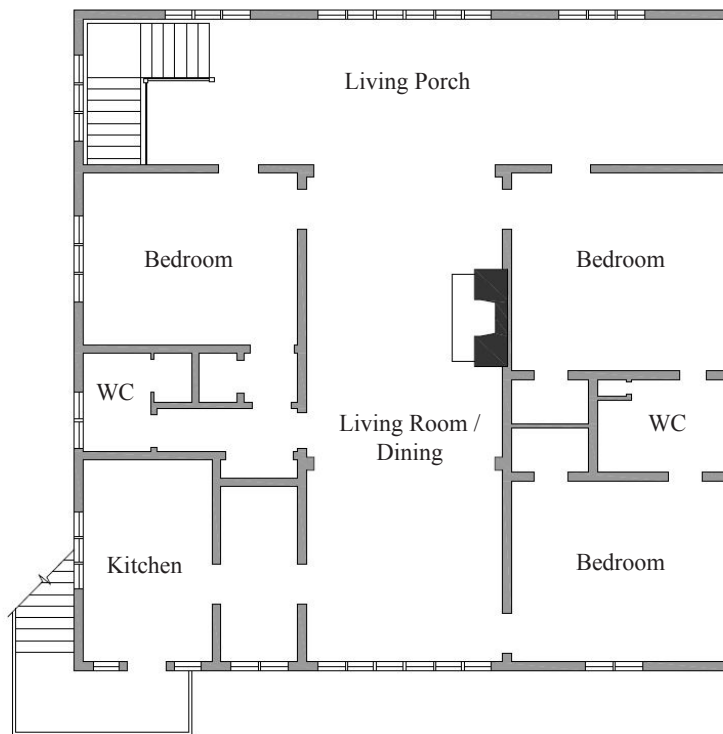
Initial design of the Panama House, Second Floor Plan. Plan followed by Quarters K - R. Drawing by author based off plans from RDA.
